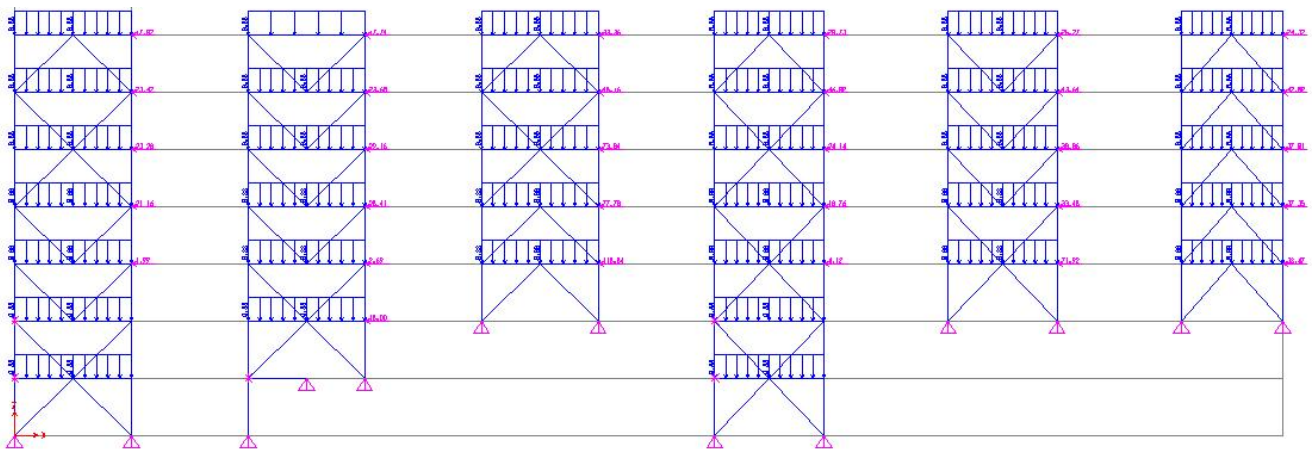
Full gravity and calculated lateral loads for connection designs
